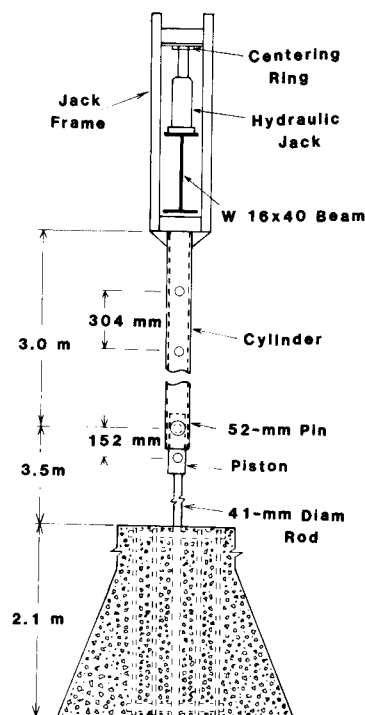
Section (B-B in Fig. 1) of the jacking assembly connecting the pull-down frame and bell-bottomed piers.
